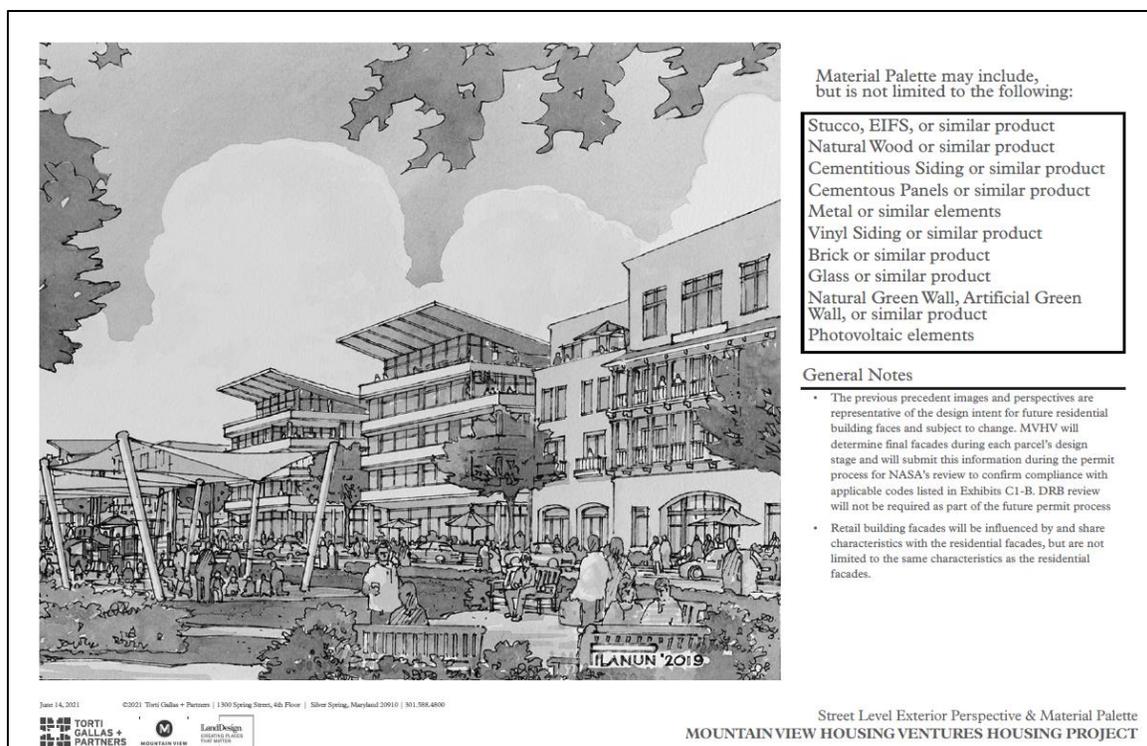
Conceptual Design Documents Street Level Exterior Perspective & Material Palette*, p. 12, lists the materials proposed for the Housing Project.
